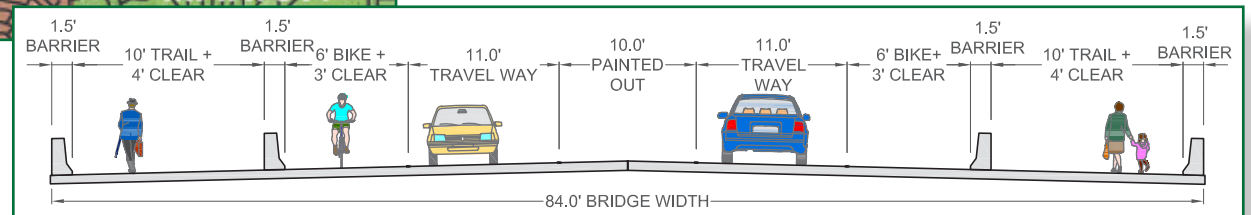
A Series of Typical Sections for Tower Terrace Road
